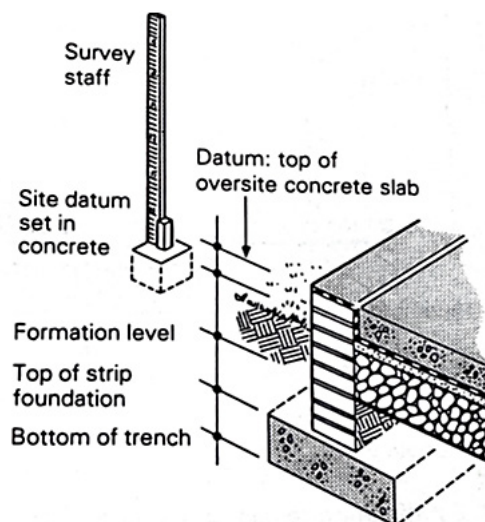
Detail of a datum in relation to the foundations
